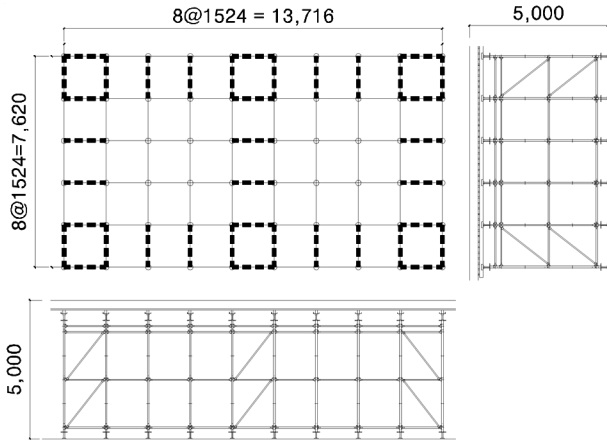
Standard drawing for concrete slab ($t \leq 300$ mm).
